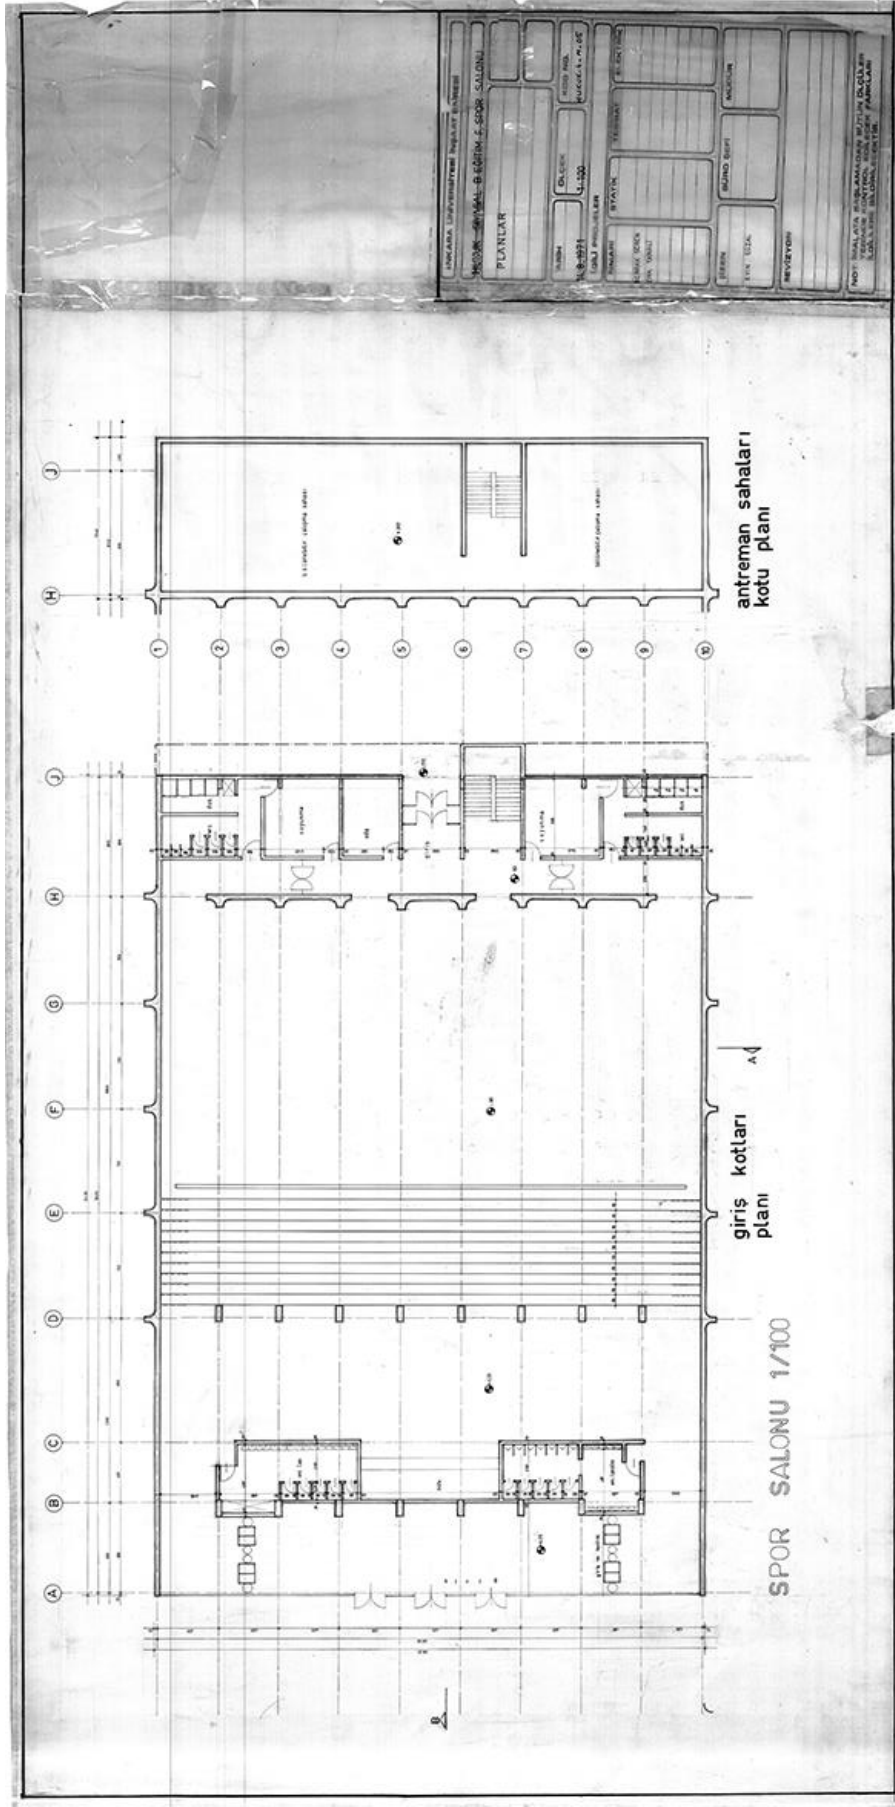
Original floor plans of the Sports Hall building (archive of Ankara University Directorate of Construction and Technical Works)
